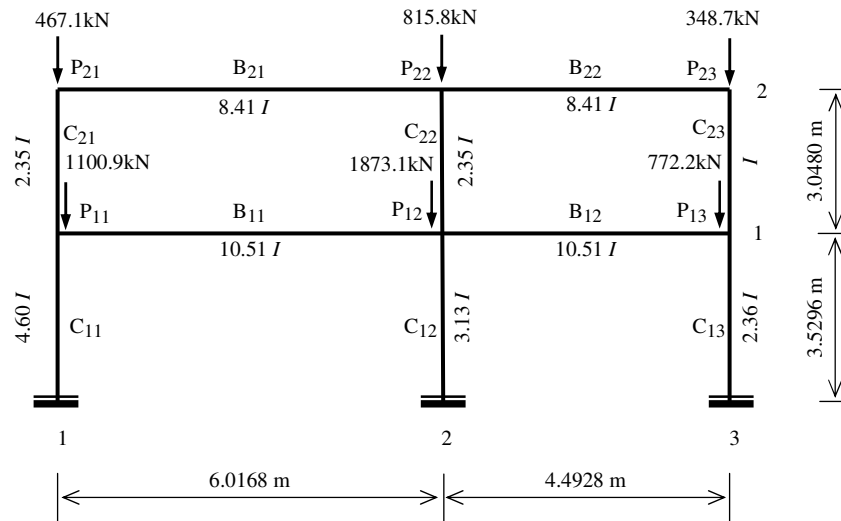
2-bay by 2-storey steel frame – Case 1
